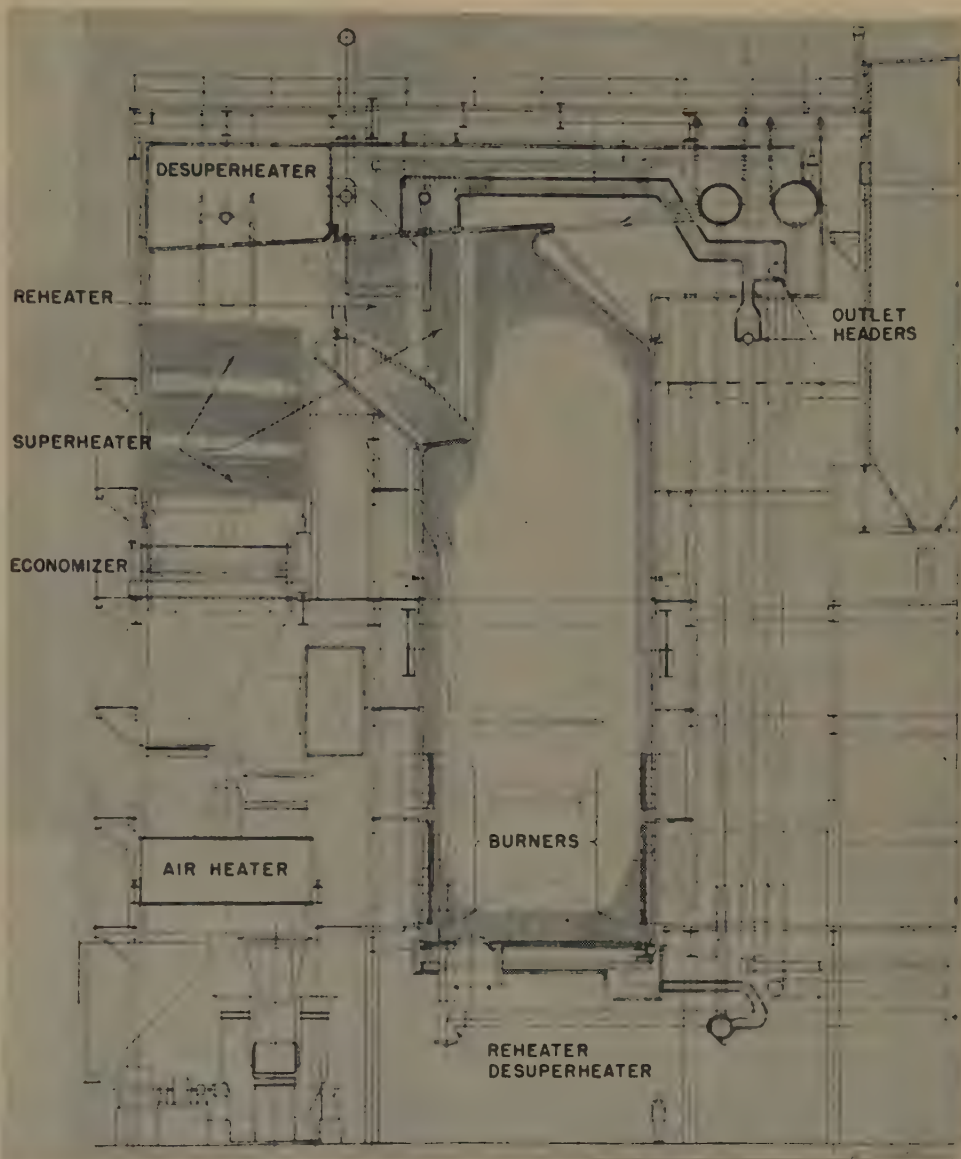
REHEAT BOILER, COAL OR OIL-FIRED, WATER-COOLED-SLAG-BOTTOM FURNACE
